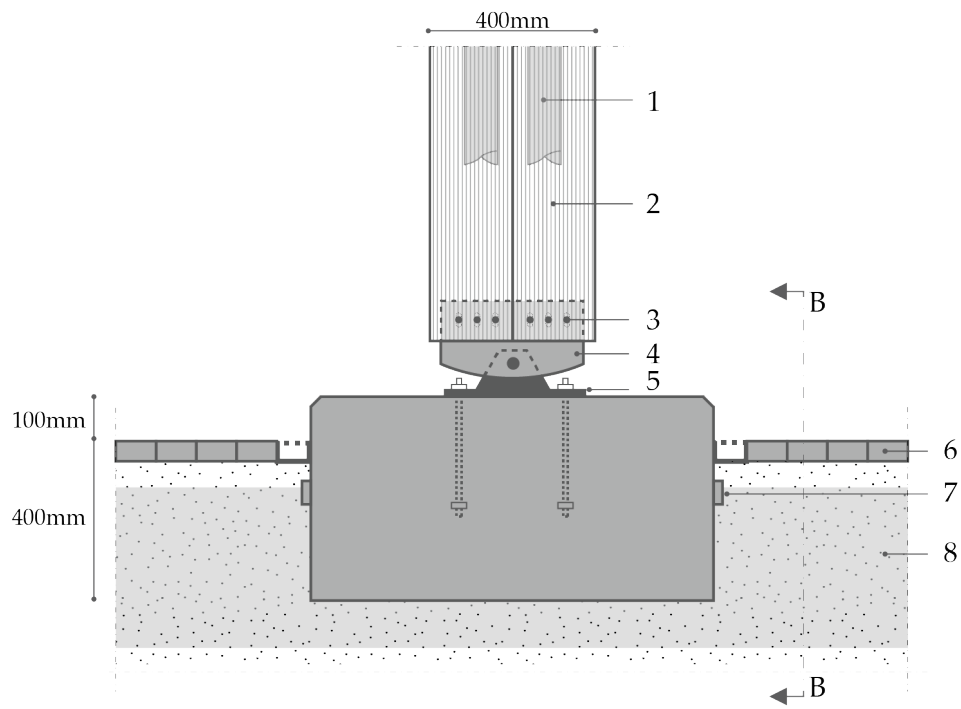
Section A-A of the ground level connection [scale 1:20]
